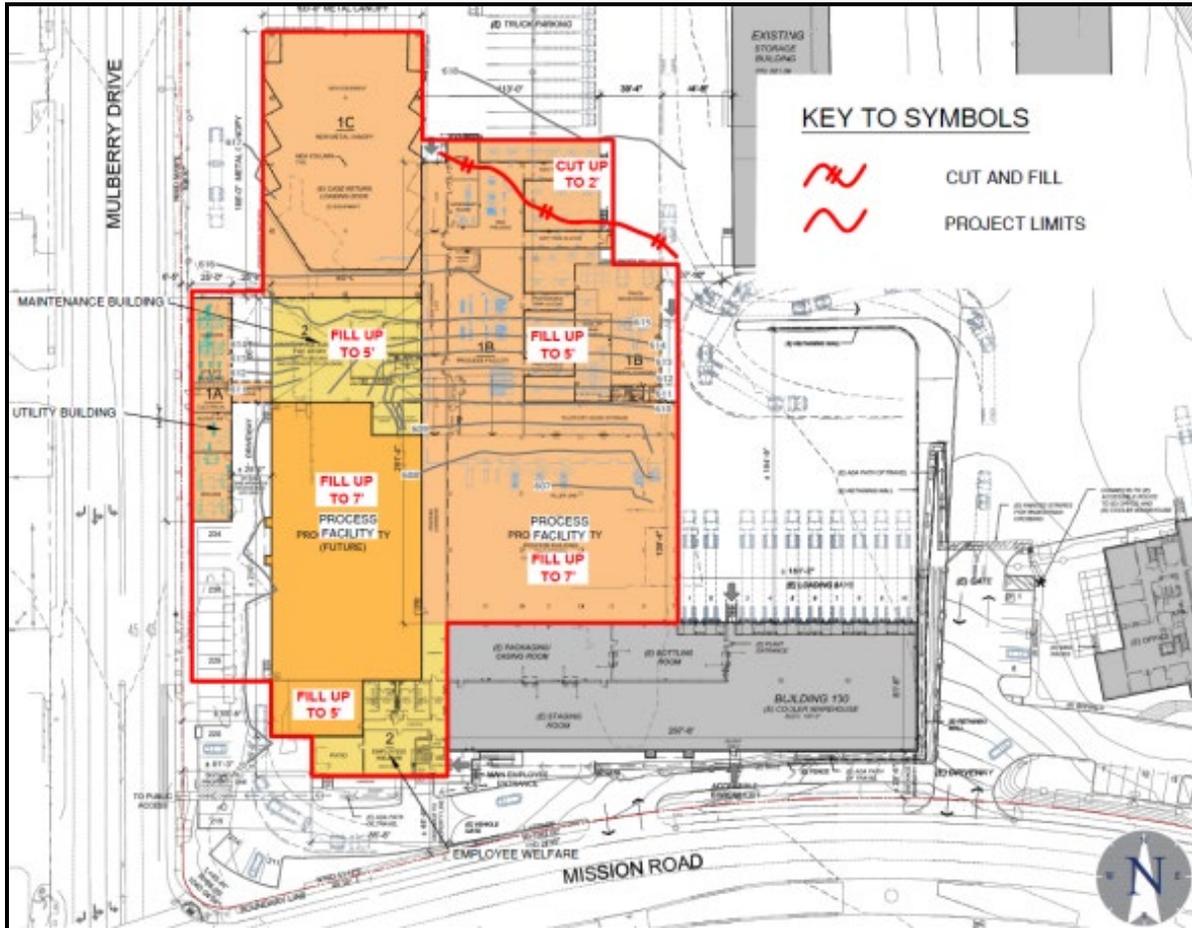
Anticipated Earthwork at Each of the Planned Buildings
